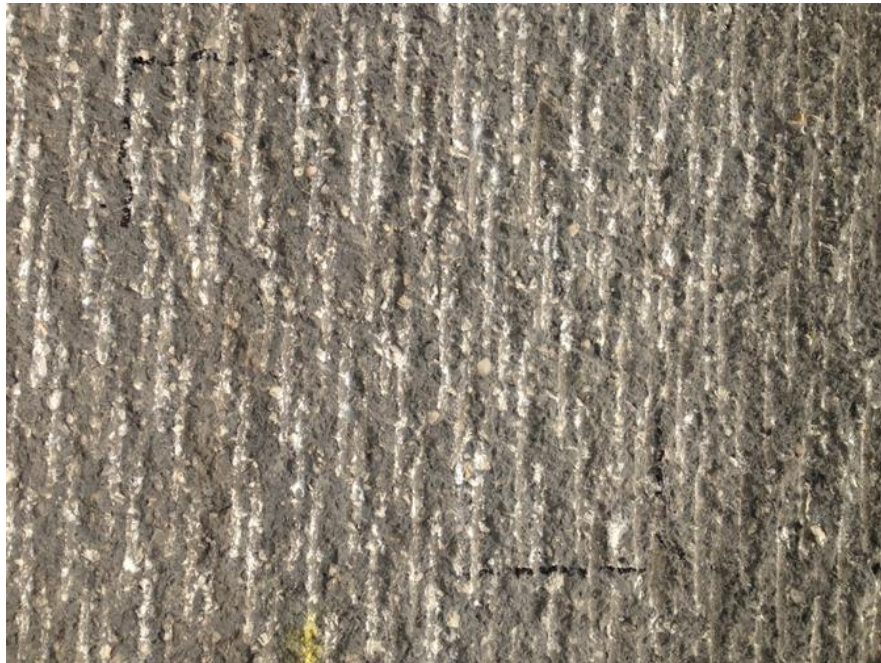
Photo taken from Wurzbach Parkway test site after the milling
